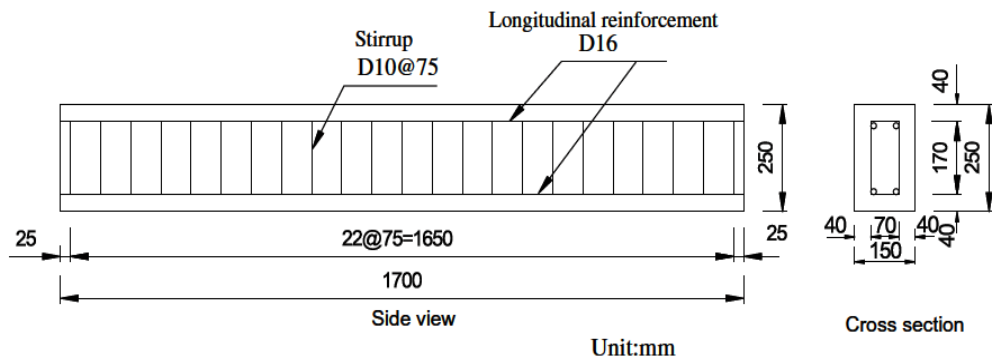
Rebar arrangement - side and a cross-sectional view (Fujikake *et al.* 2009)
